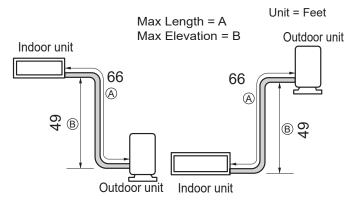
Typical LH188HV1, and LH248HV1 System Layout.
